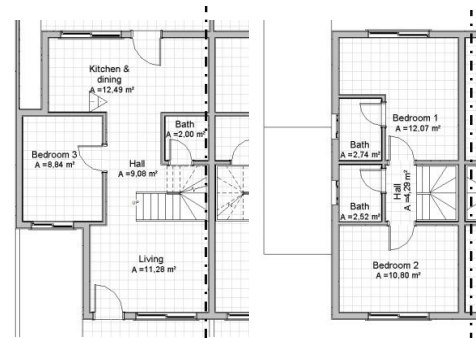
Case 2 - Floor design: left-ground story; right-second story
